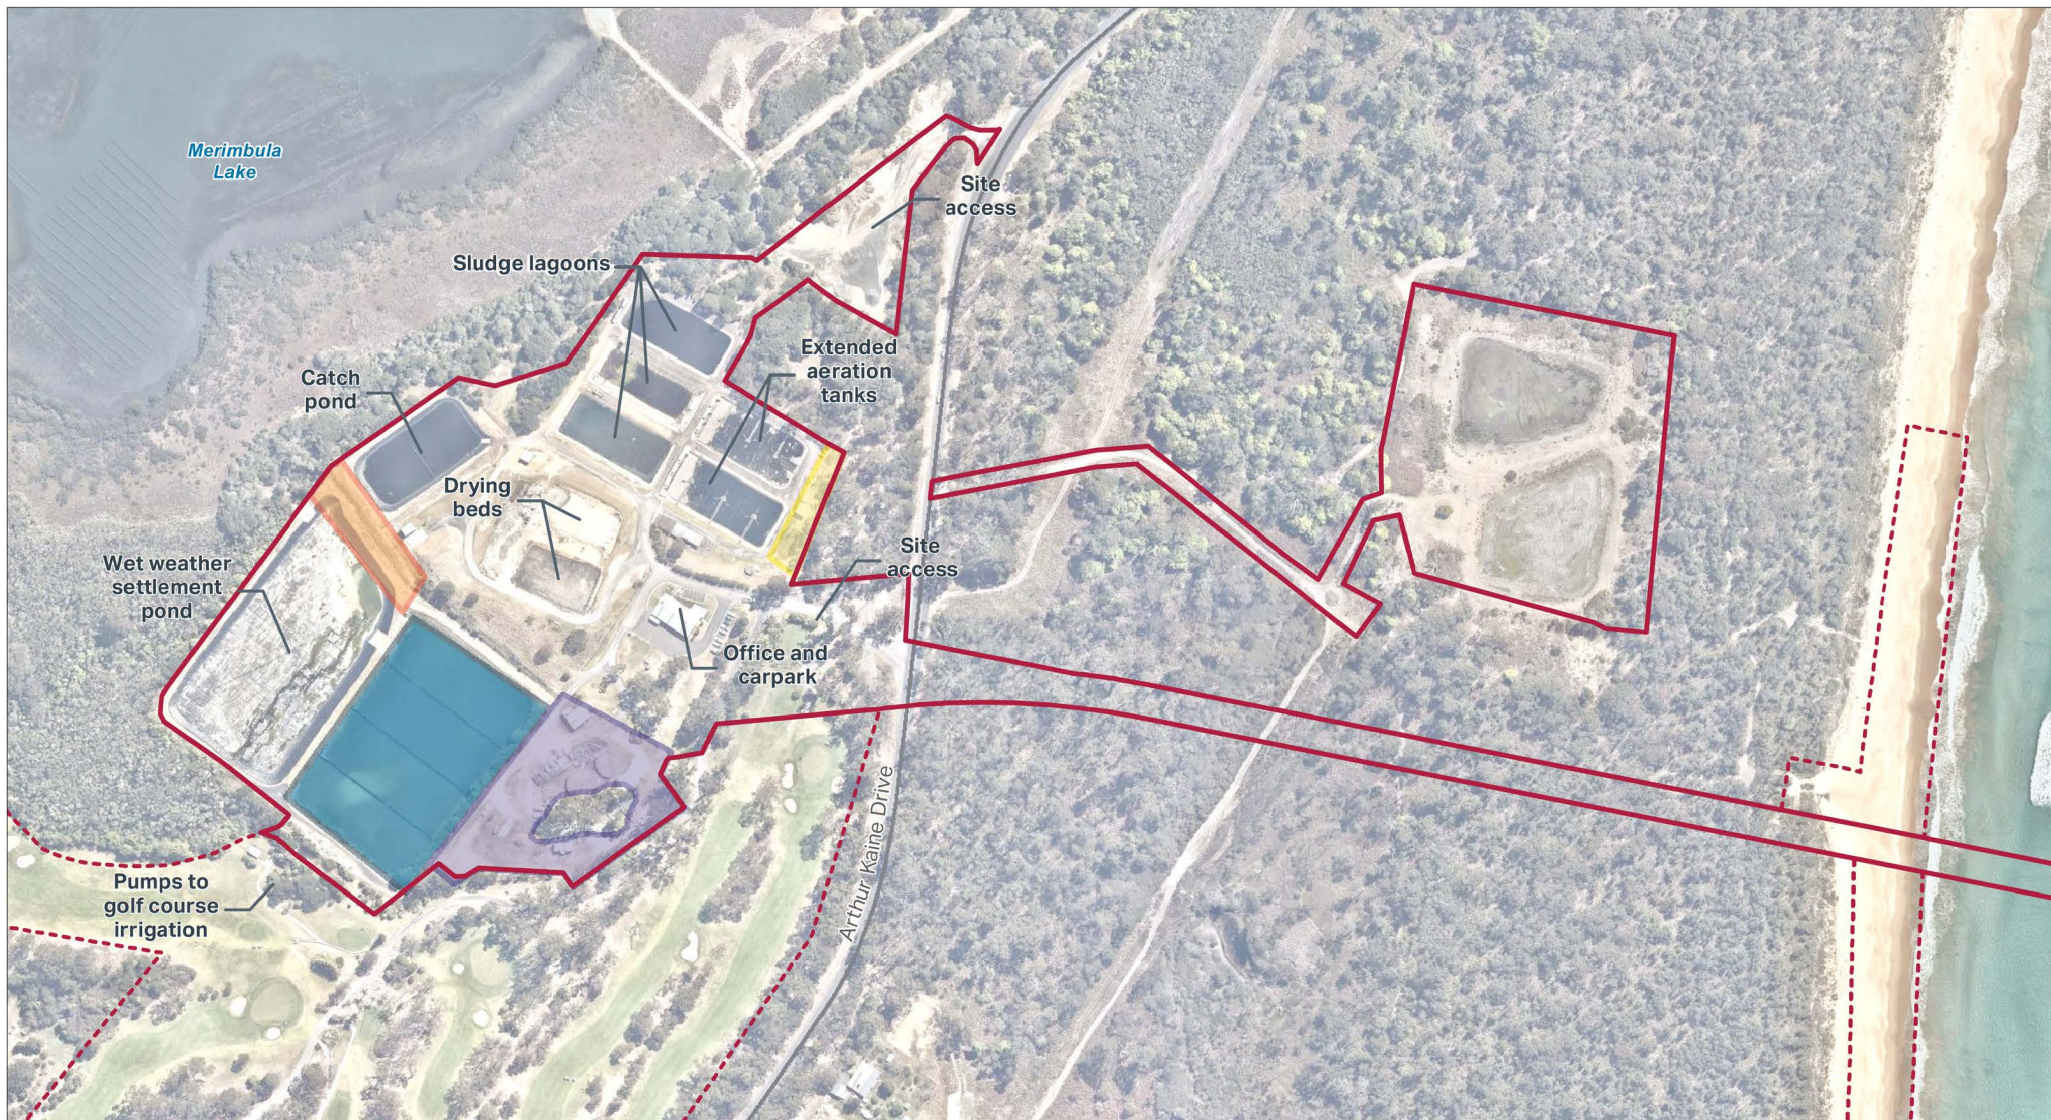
PROPOSED STP LAYOUT (INDICATIVE)
